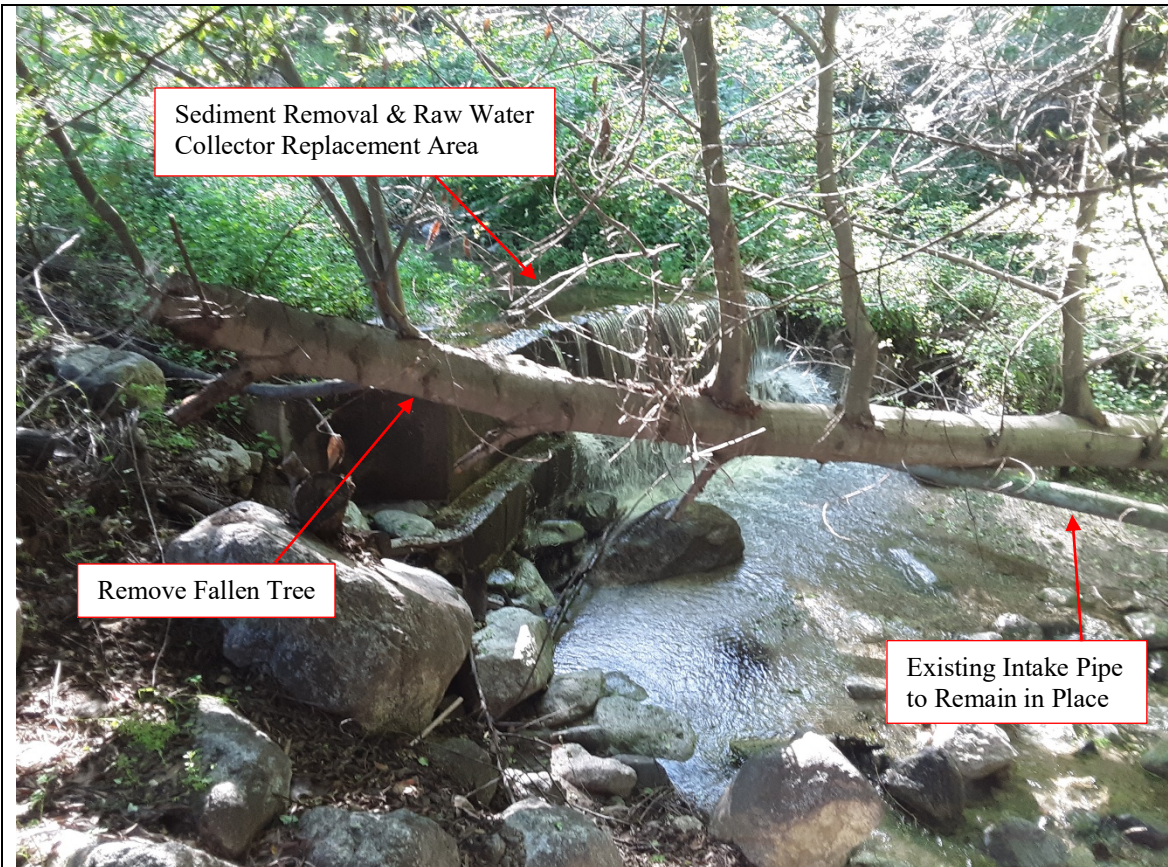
Looking SE at existing intake structure from N side of Sawpit Wash.
